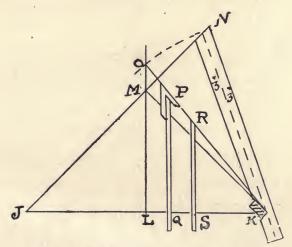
PLAN AND LAYOUT OF A SIMPLE ROOF.
